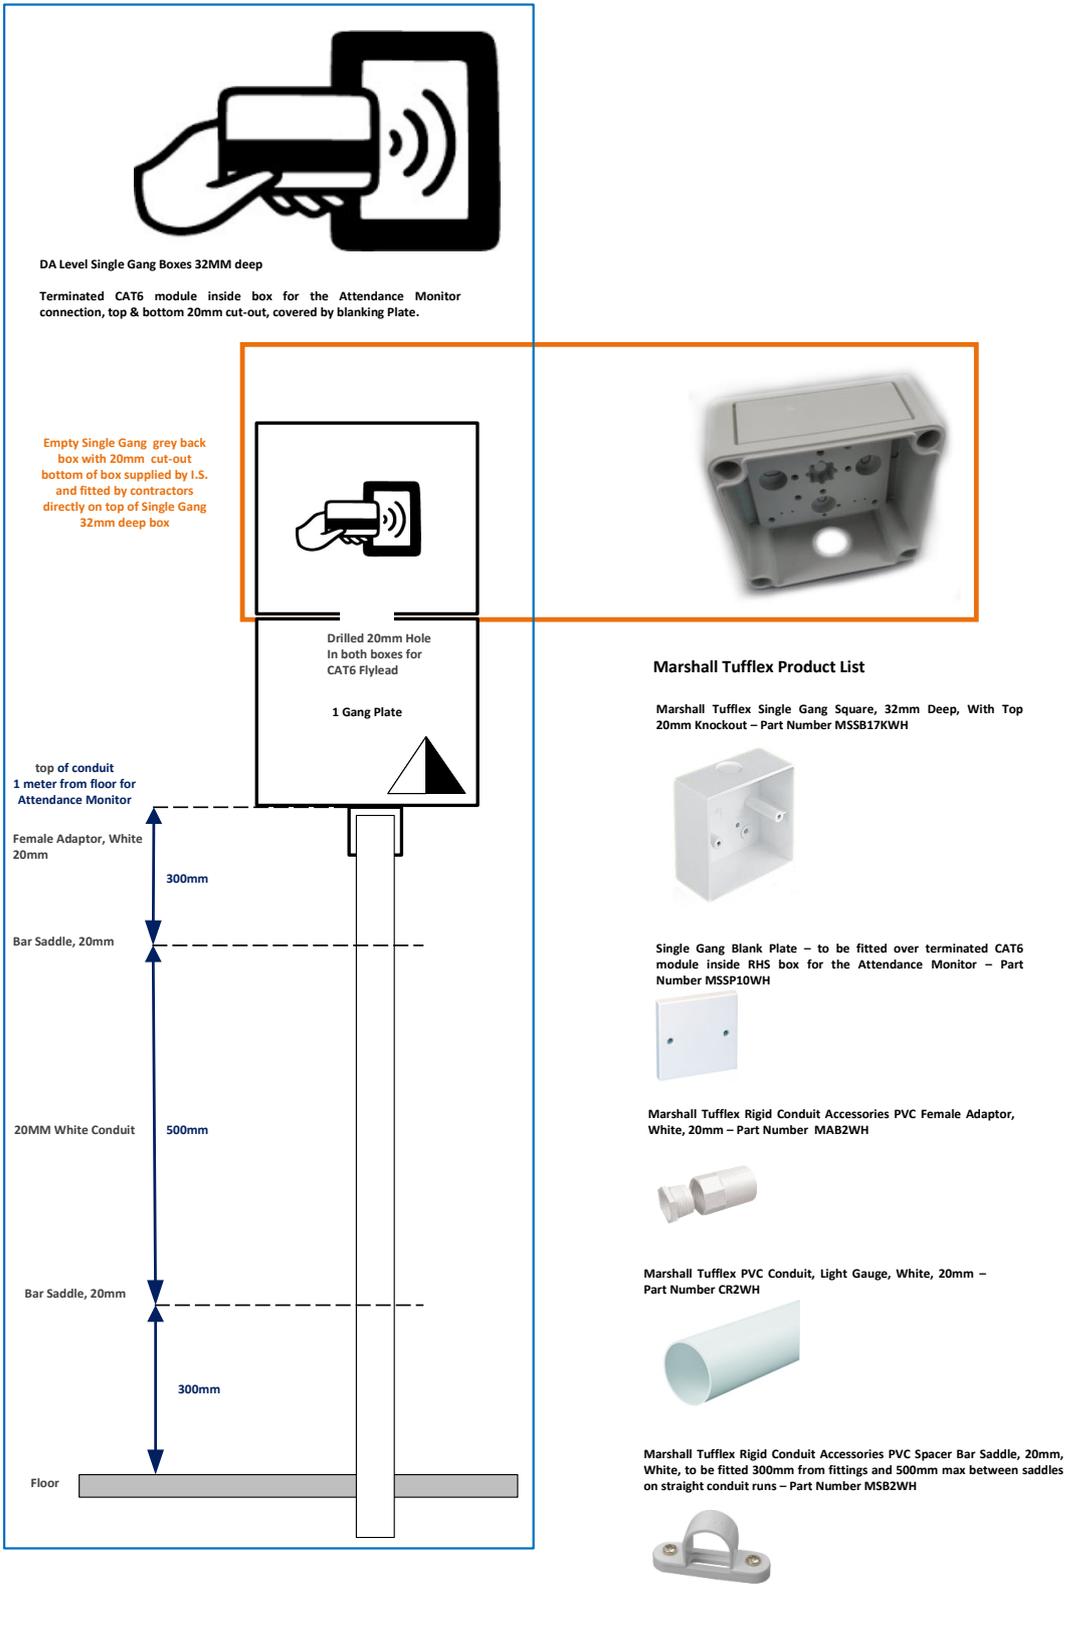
Attendance Monitor Point - Installation Through Floor Into Rooms
